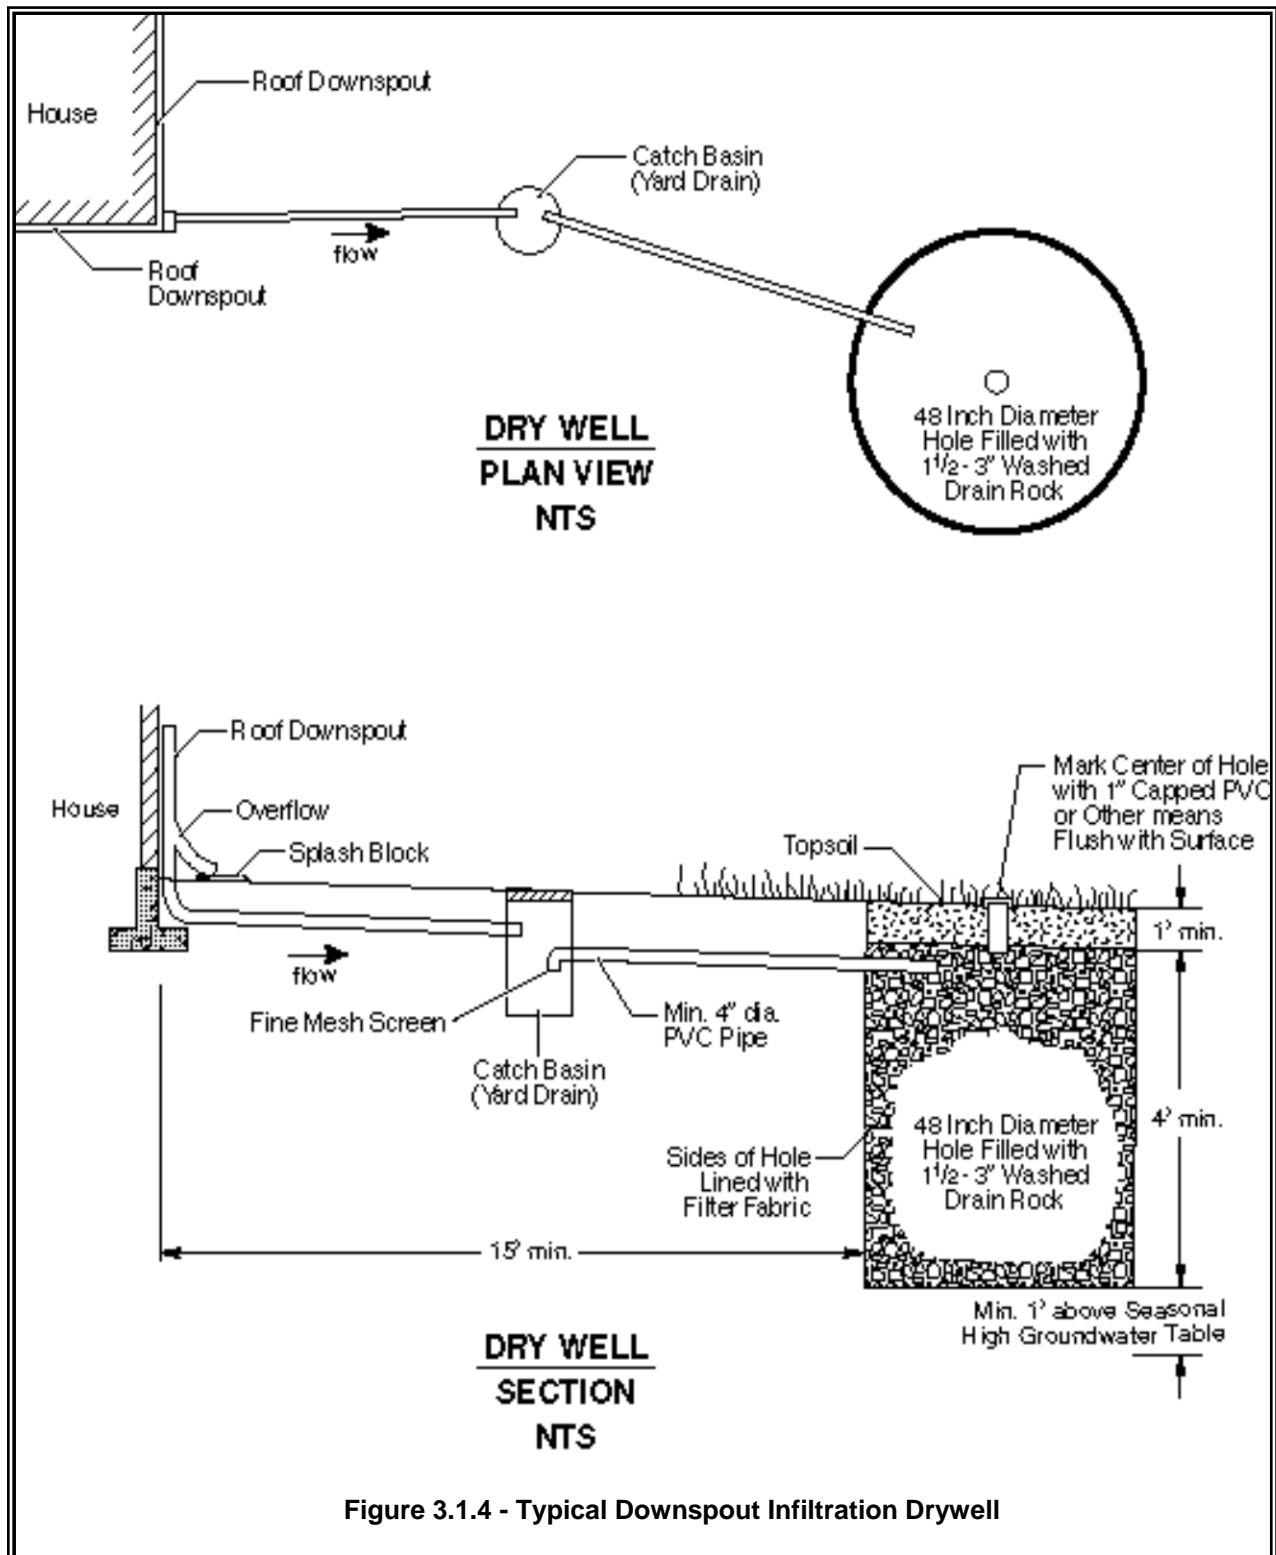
Typical Downspout Infiltration Drywell
